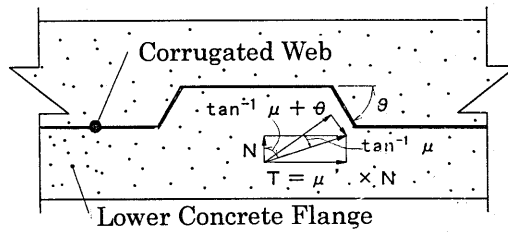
Interaction Mechanism for Corrugated Steel Web and Concrete
